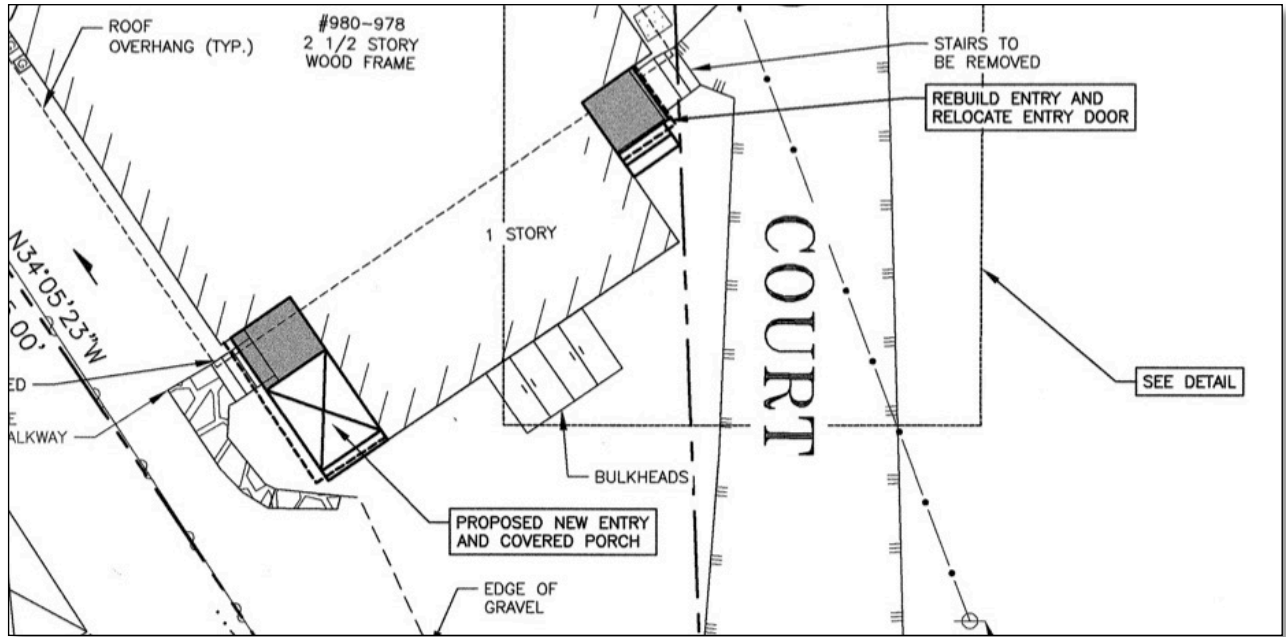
Overview showing existing and proposed changes. (Extract from survey plan, Appendix 4)
